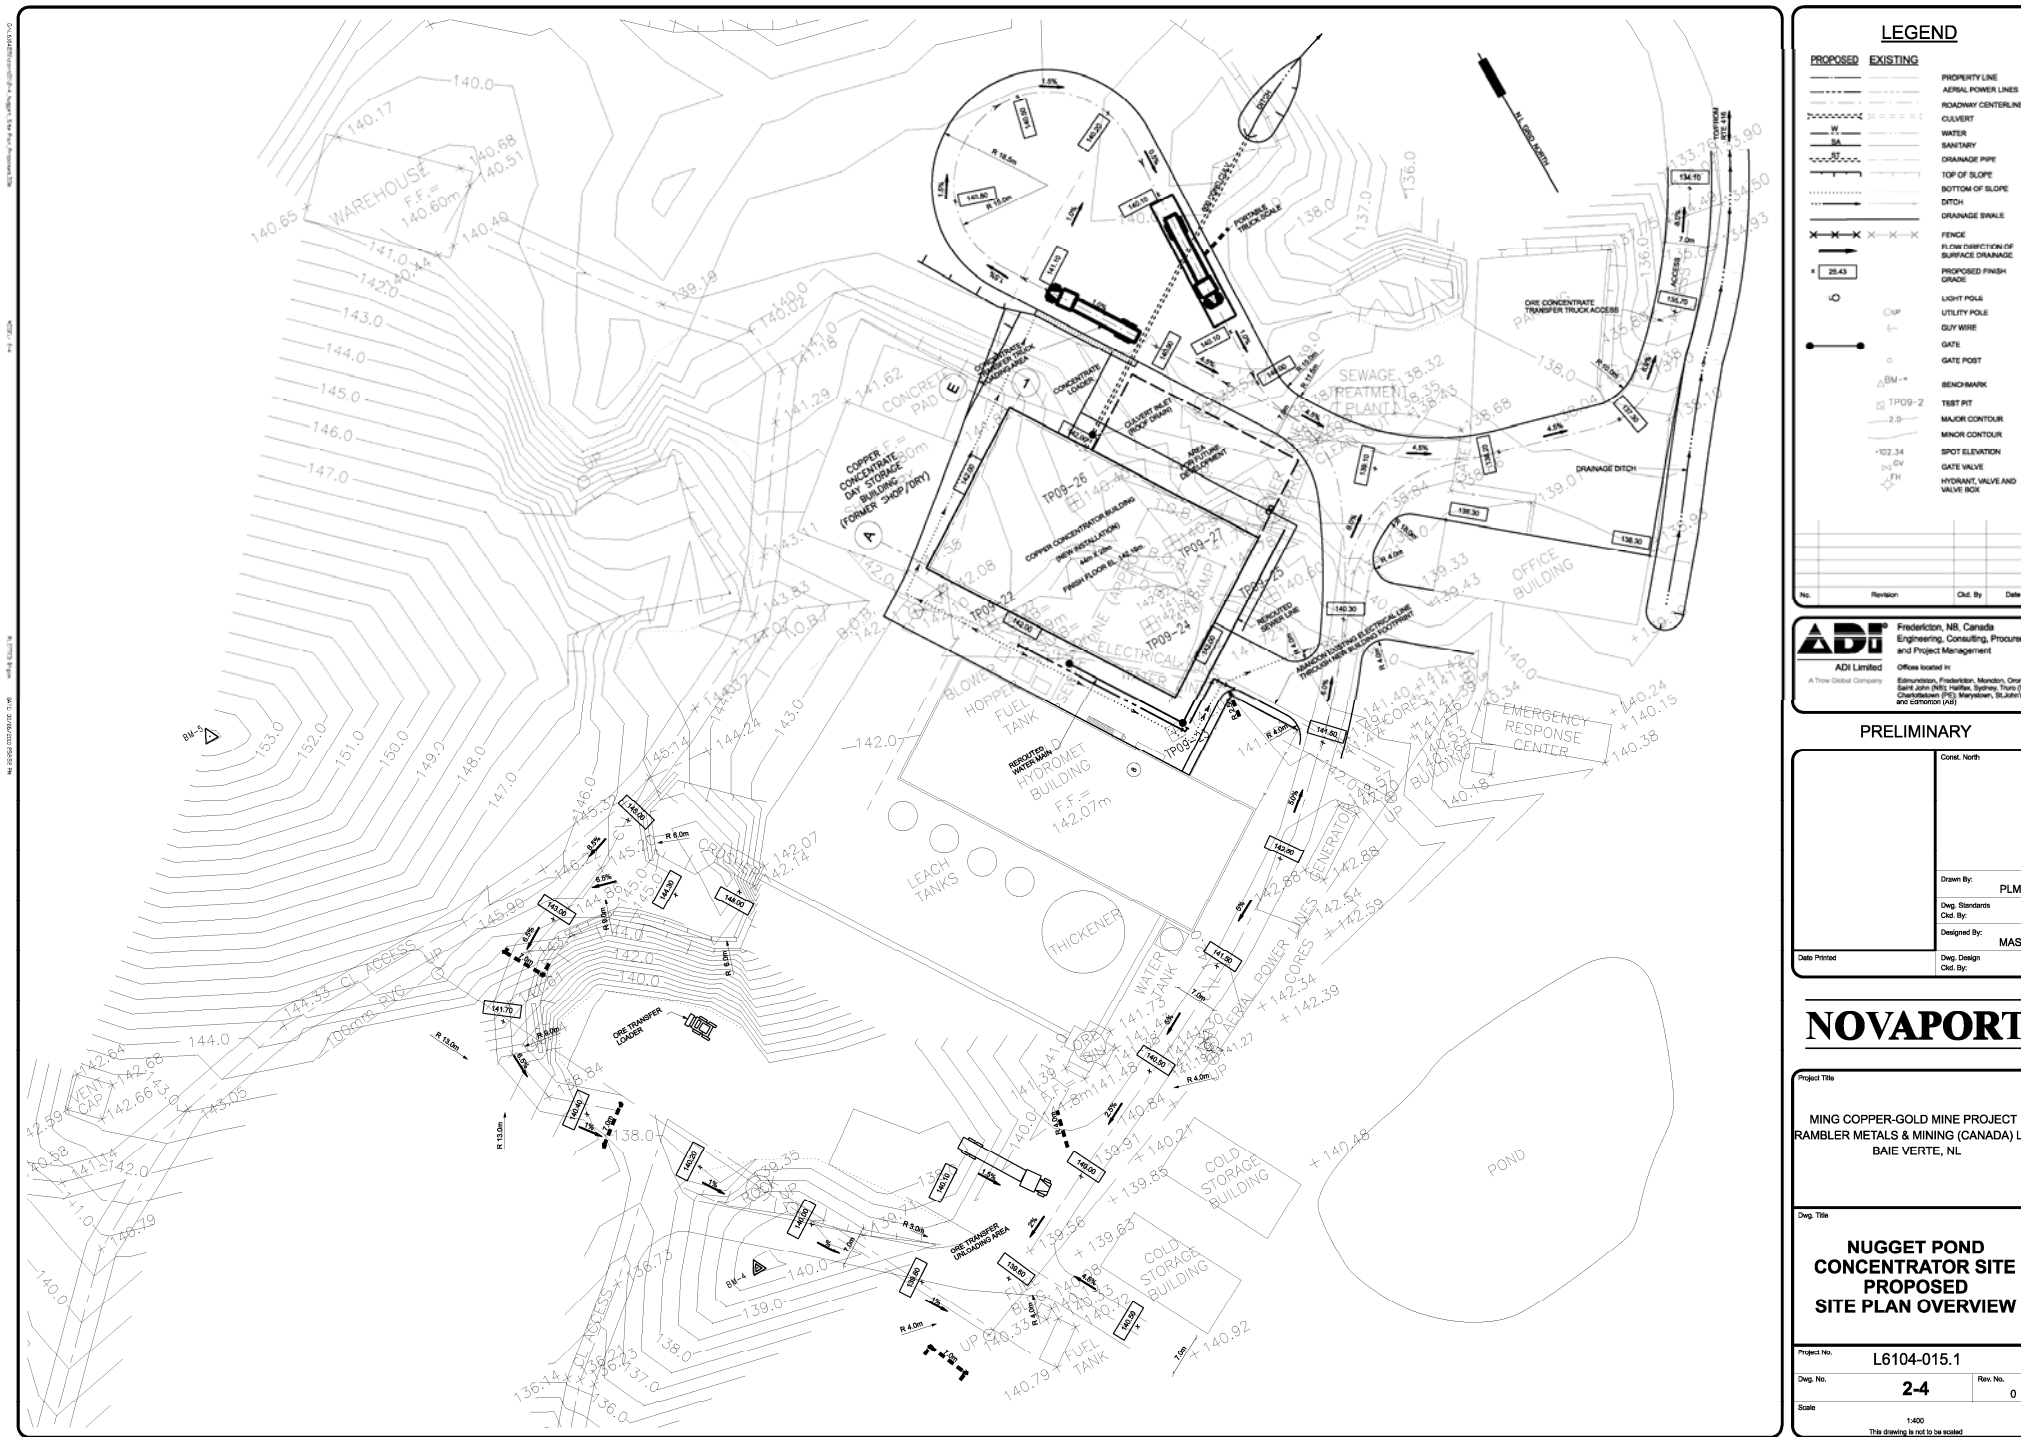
Planned Infrastructure at the Nugget Pond Site
